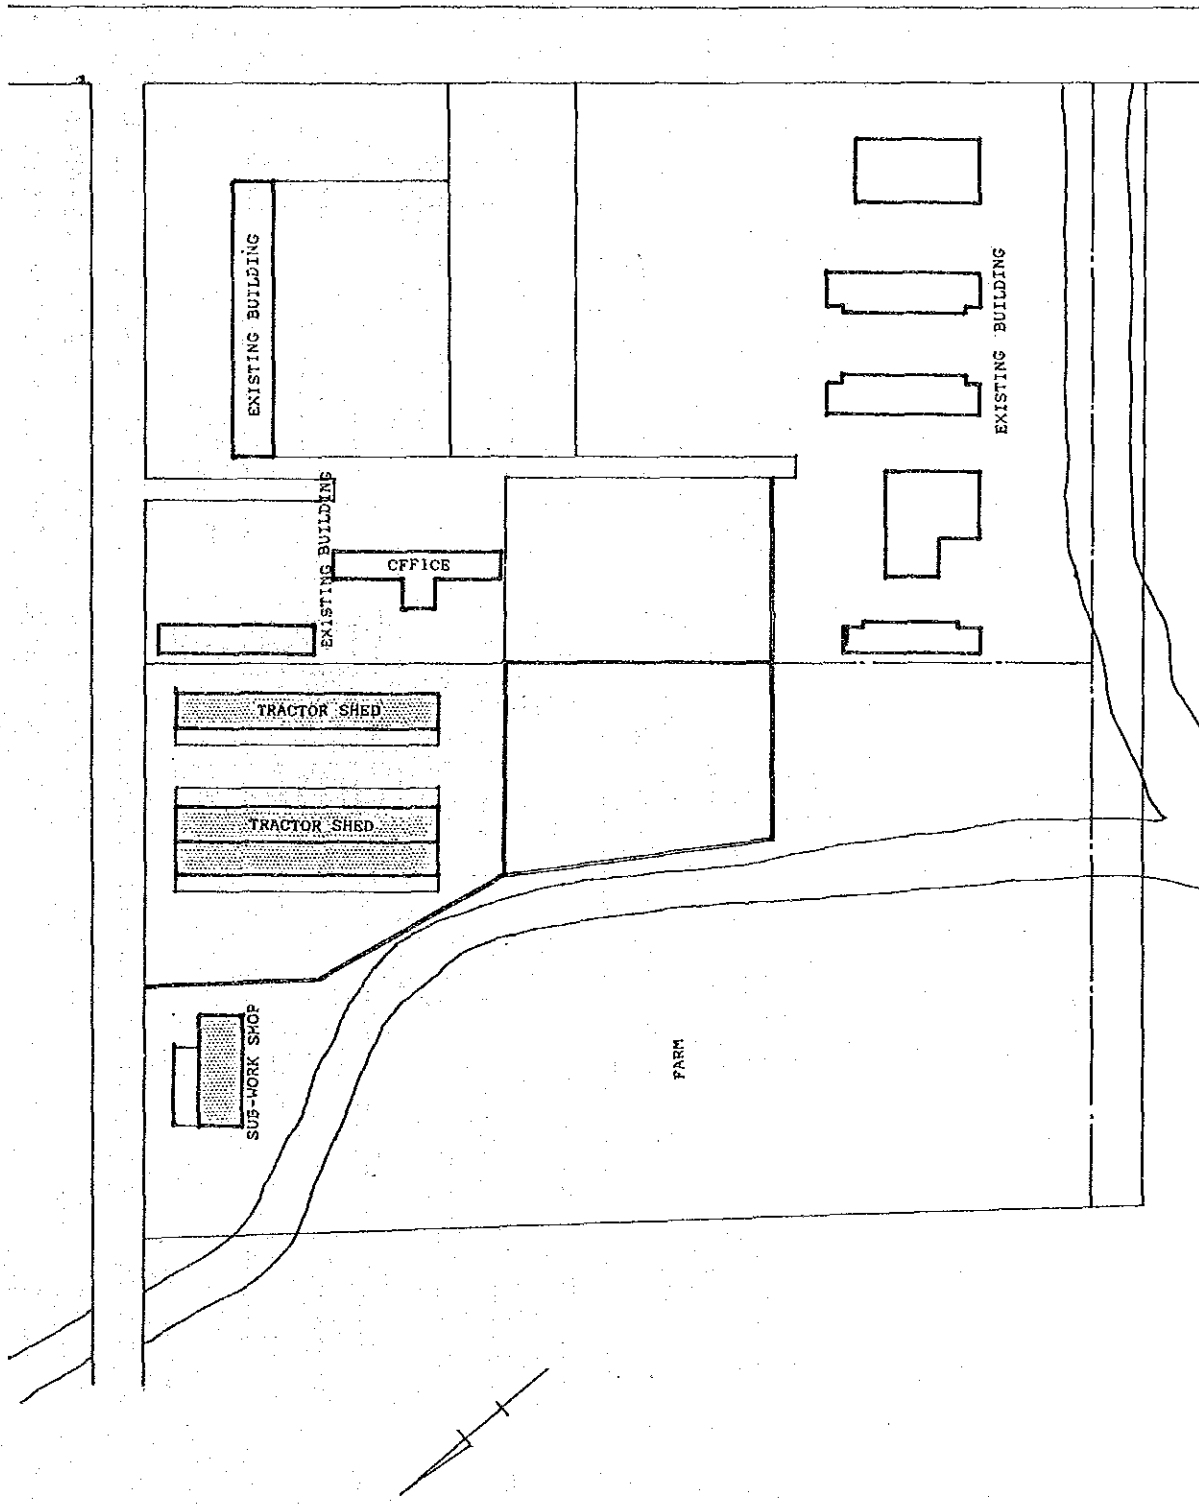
PROPOSED SITE PLAN OF AMS SUB STATION (SIHARA MARKAZ)
